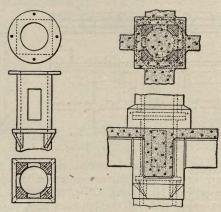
Special Top for Cast Iron Column; Column and Girder Connections.
